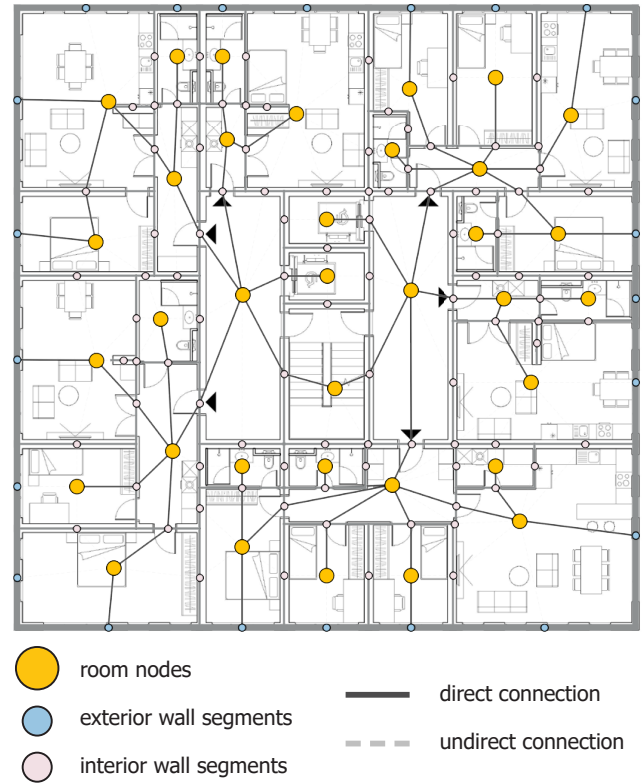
Illustration of room connectivity in a floor plan by representing access relationships between rooms and the external environment
